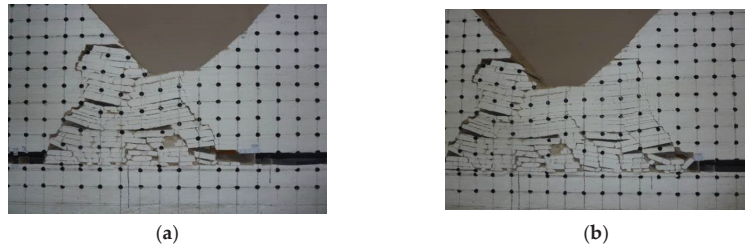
Overburden damage of the roadway. (a) Overburden rock collapse. (b) Asymmetric damage.
